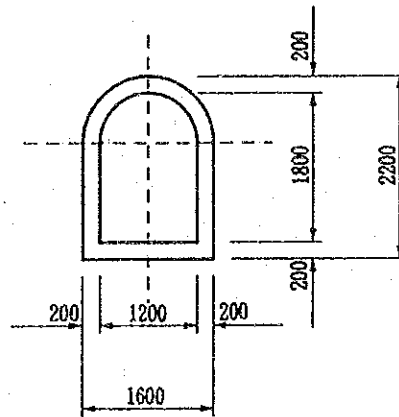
Standard Section of Tunnel No.5 (Main Canal)
